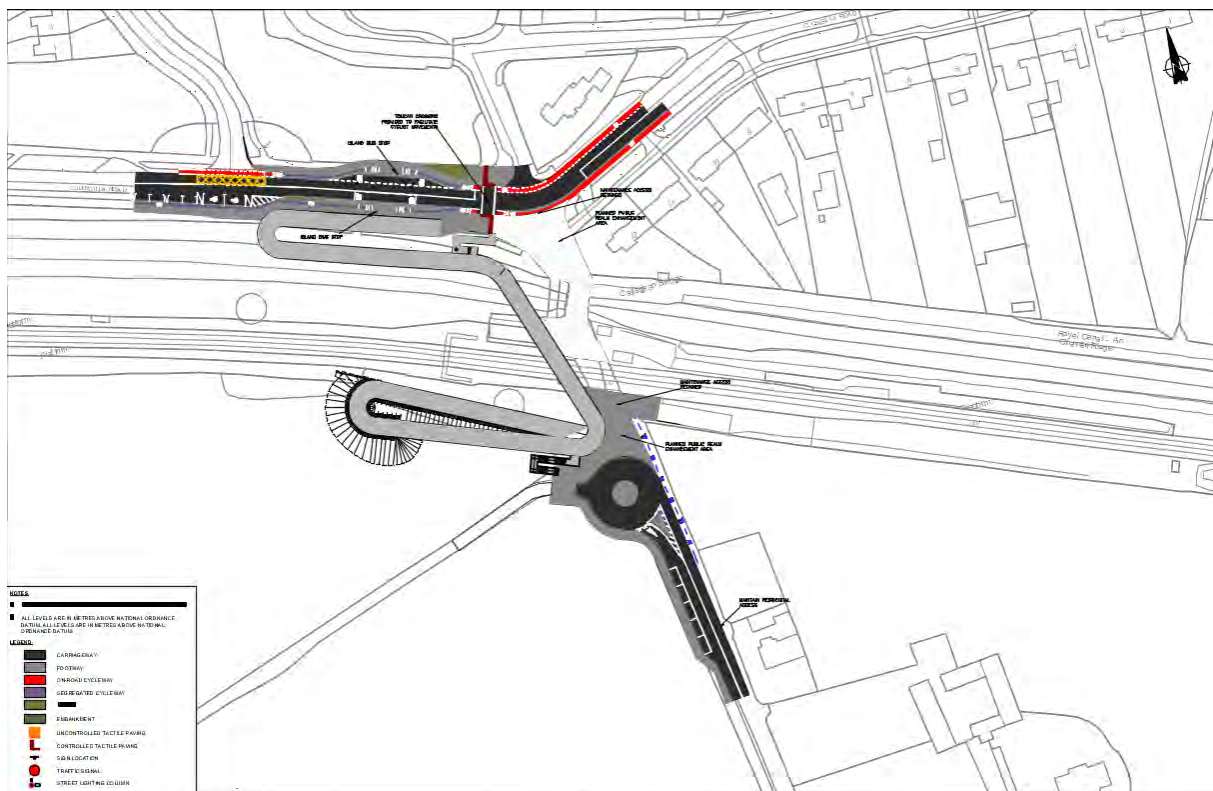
Proposed pedestrian and cycle bridge at Clonsilla
